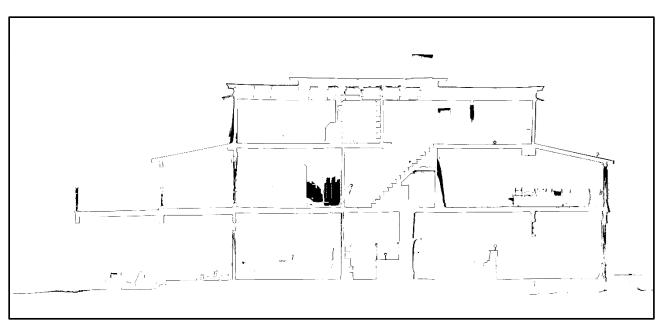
Tomographic slice from laser scan data through section showing through the center of house, and interior section of the house revealing floor levels.
